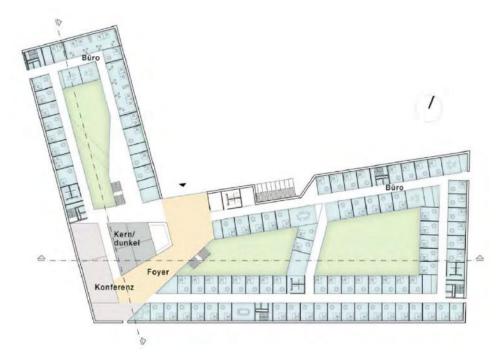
Floor plan ground level. kadawittfeld architecture (Aachen 2016)
